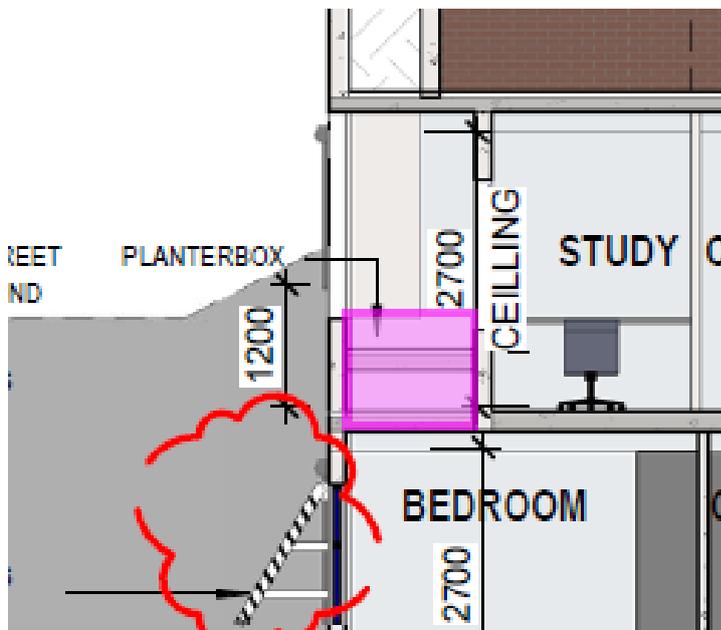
Level 2 planters are under roofs and are recommended to be deleted
